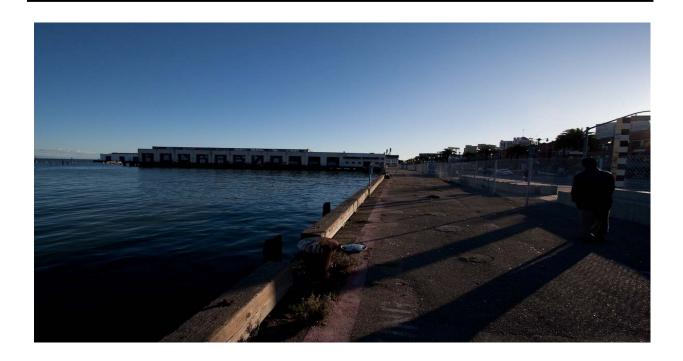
Existing Site Views from the North Elevation and Pile Remnants of Former East End of Pier 36
